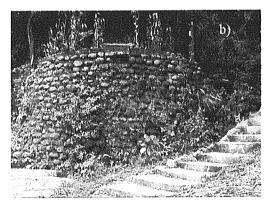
Undamaged reiforced-soil retaining wall and adjacent masonry wall (along District Road No. 129; site 6 in Fig. 1)
